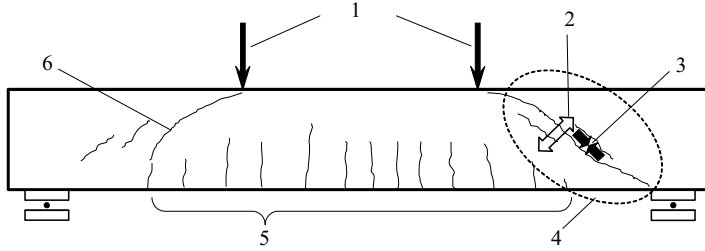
Typical failure modes of reinforced concrete beams: 1 — loads; 2 — tension; 3 — compression; 4 — shear cracks/failure; 5 — flexural cracks; 6 — shear-bending crack/failure.
